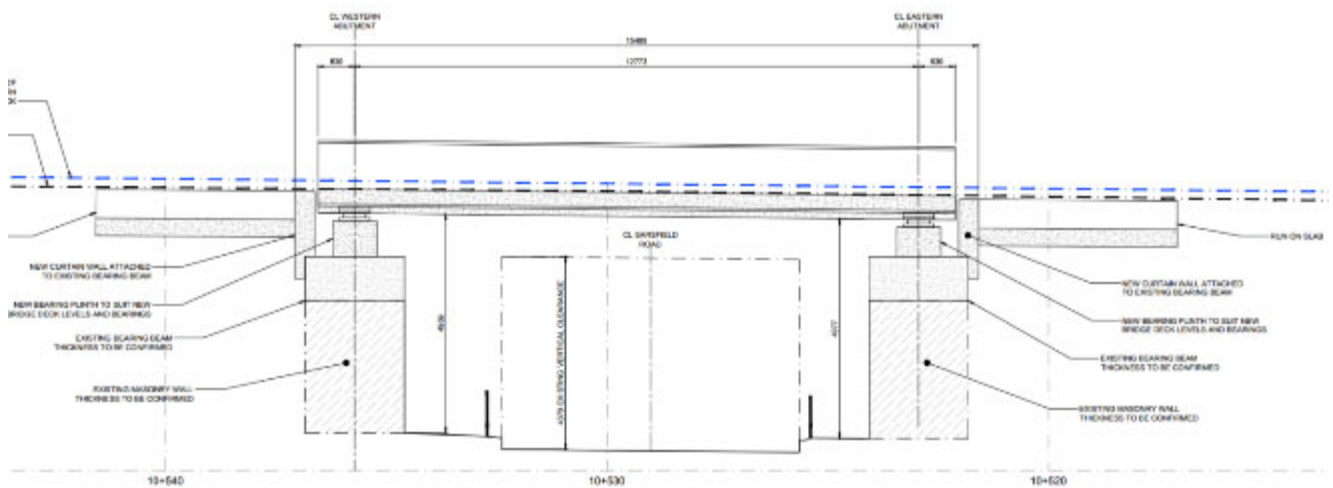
Sarsfield Road Bridge (UBC4) Northern Bridge Deck Longitudinal Section
